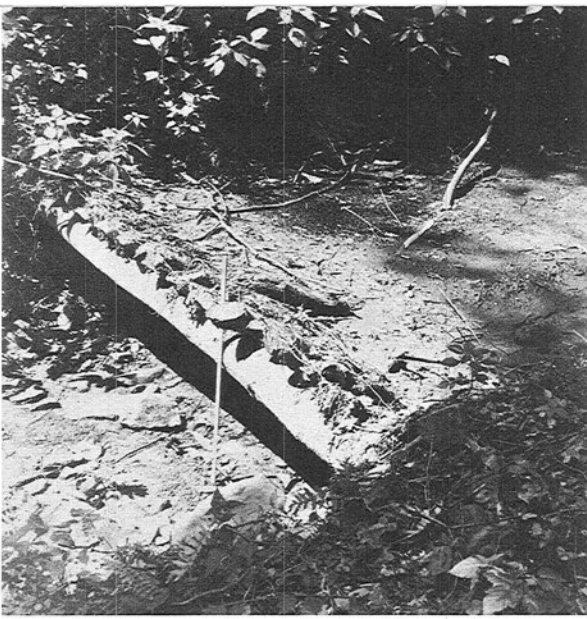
A small filter dam, used to trap sediment. The dam was made of a crosslog, posts, stock wire, and straw.
